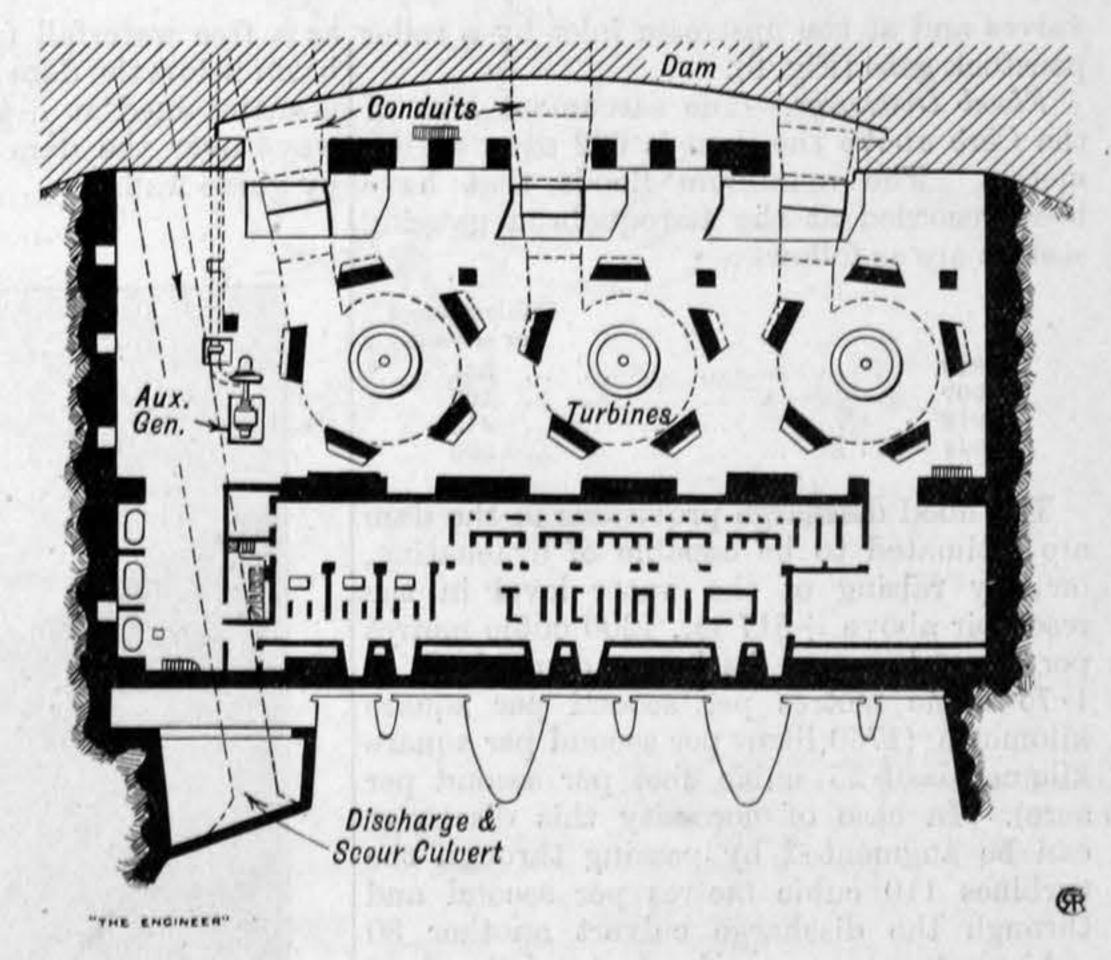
AND 6-PLAN AND SECTION OF ST. ETIENNE-CANTALES DAM
